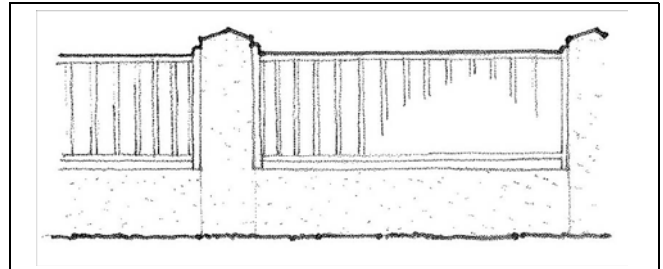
Another design suitable for the Residential 2 zone, which uses plastered concrete or concrete block, and timber infill panels.
